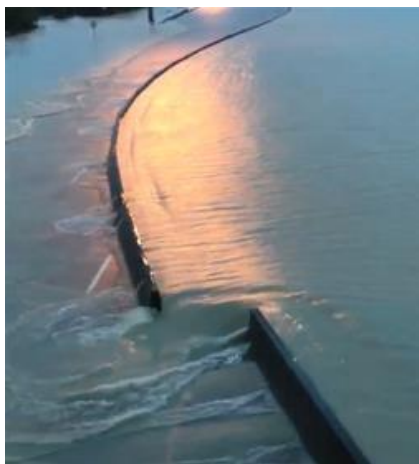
Examples of Flooding Scenarios Where Rigid, Solid Median Concrete Barriers Are Implemented.
